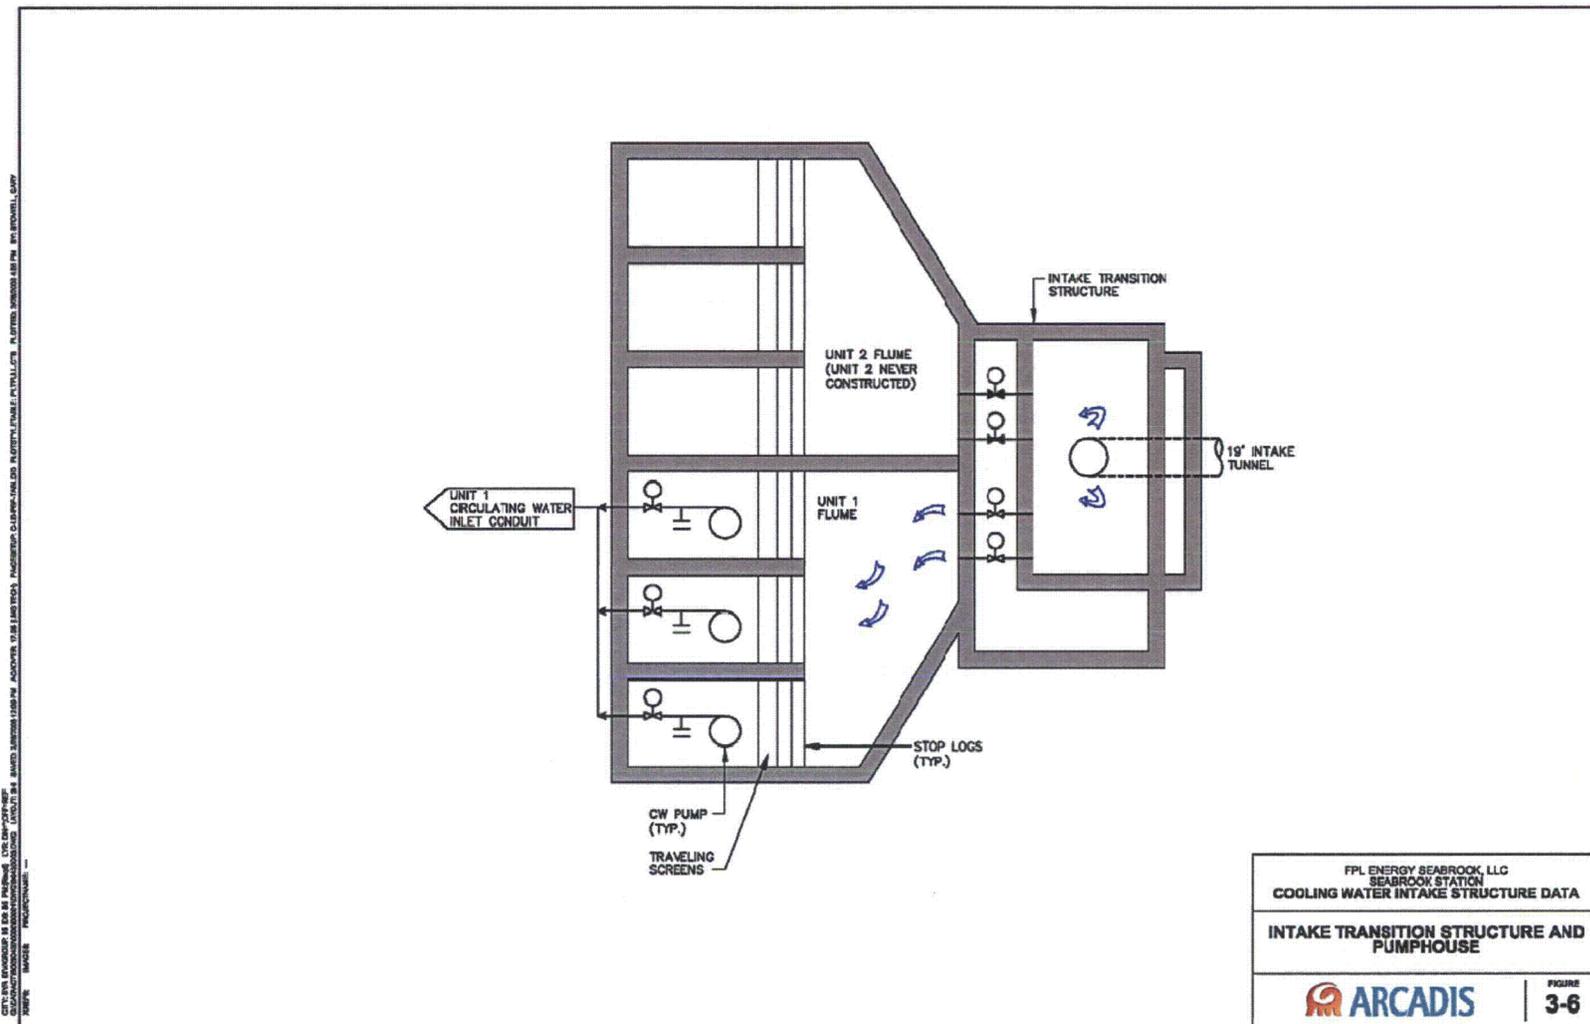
Intake Transition Structure and Pumphouse at Seabrook Station.
